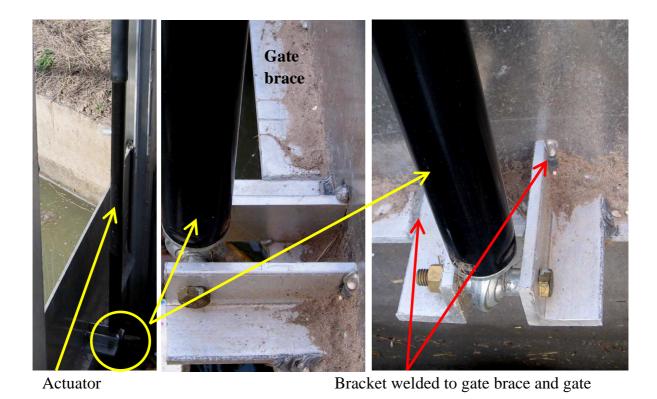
Bracket construction and attachment to the moving part of the actuator and the gate.
